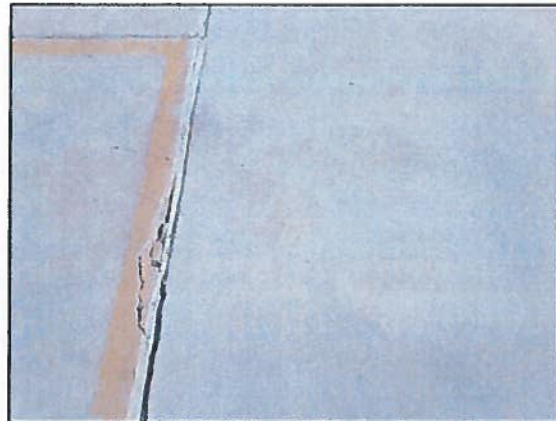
Maintenance Facility – Small spalls in concrete driveway
